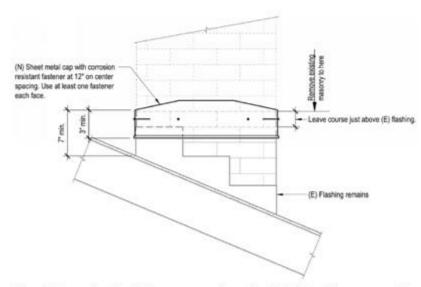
Capping of chimney removed to roof level (similar to chimney removed to top of firebox).
